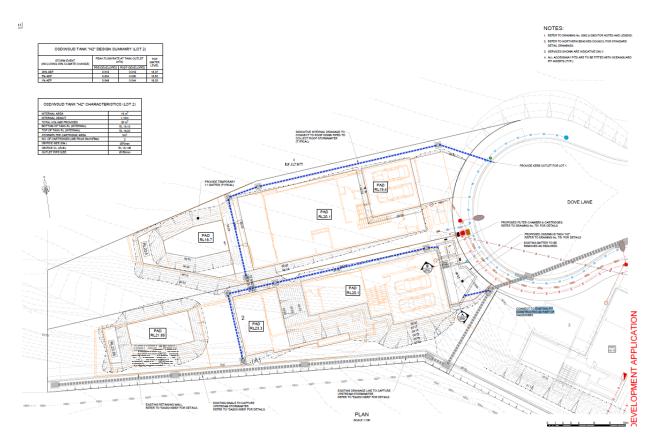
Civil Engineering Plan extract (Source: Craig & Rhodes)
